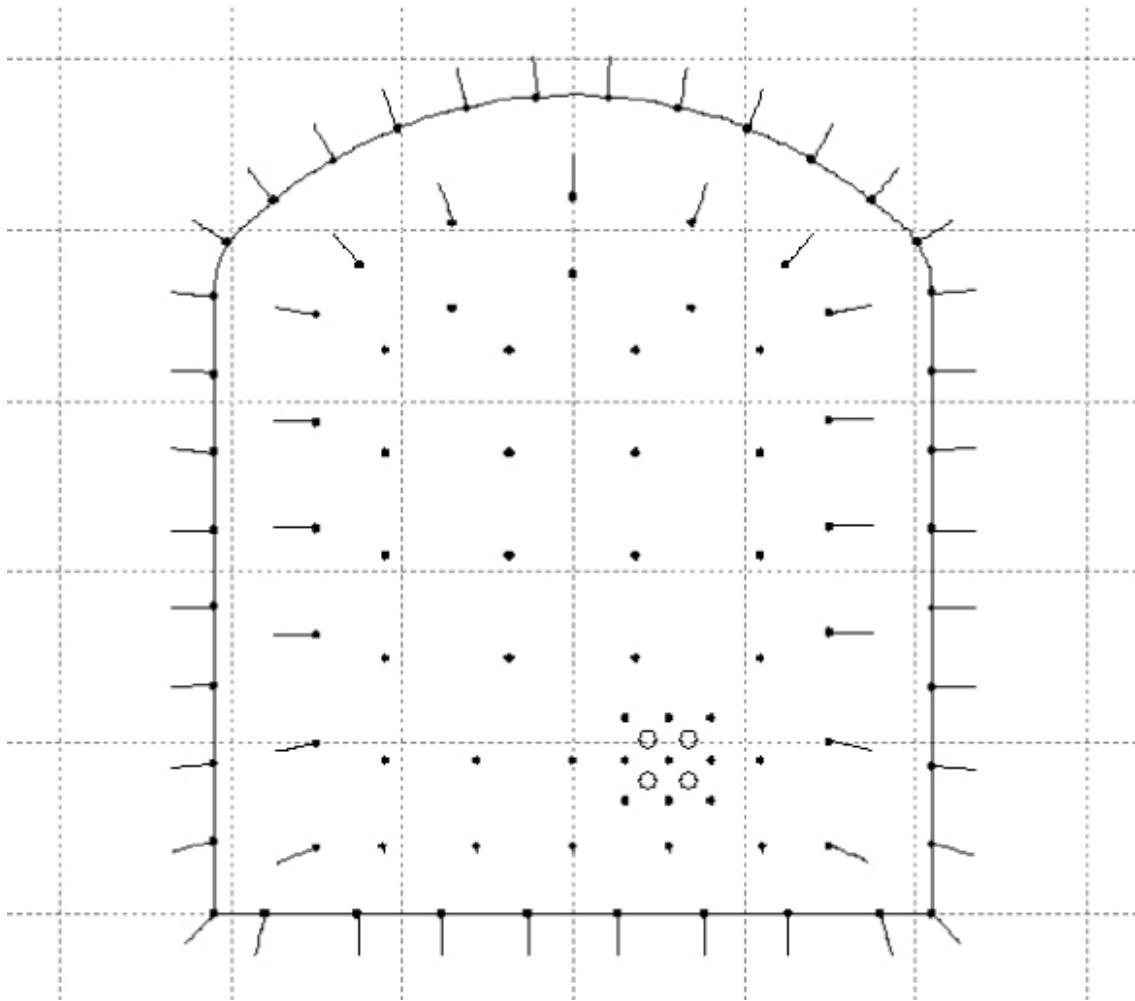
Drilling plan for excavation section 4 (1 m grid).
